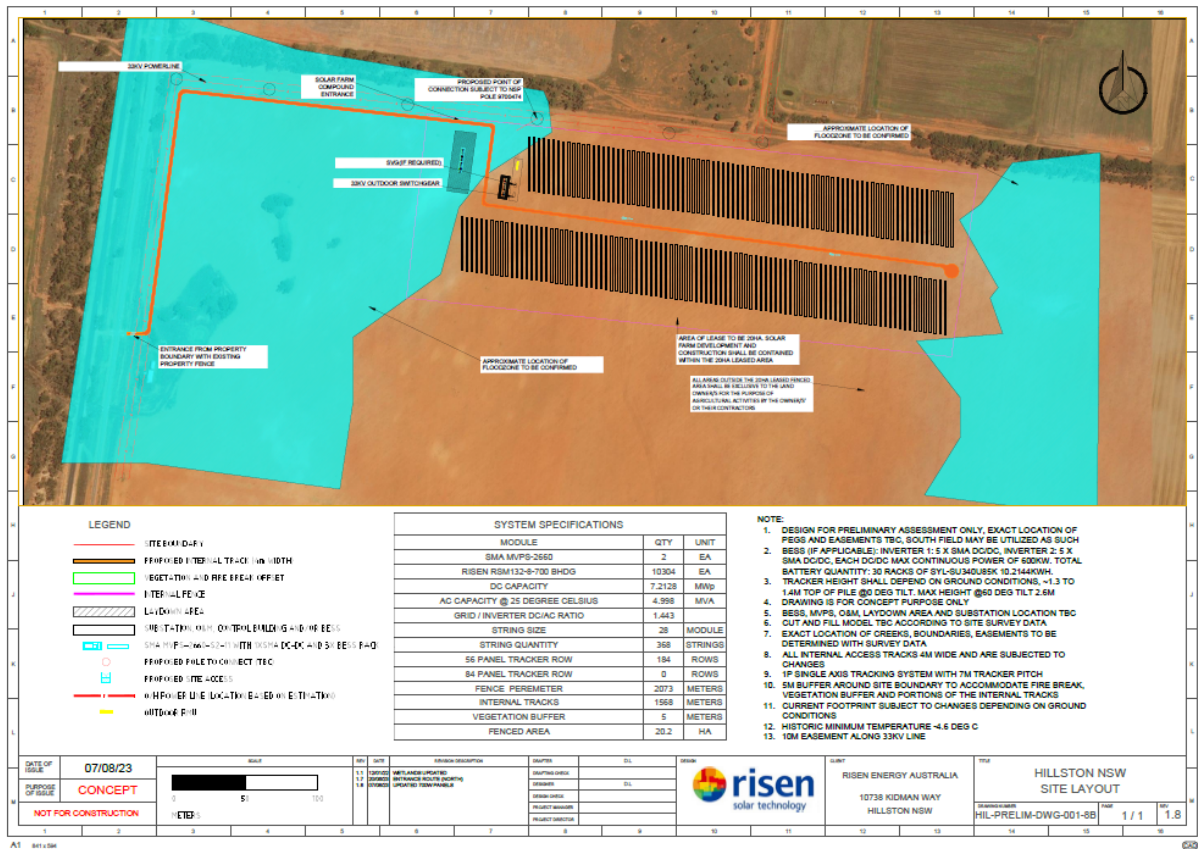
Development layout - Site context plan- access from Kidman Way (Source: Risen Energy Australia, 2023) .
